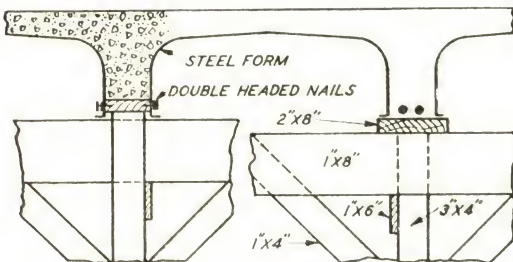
Forms for Reinforced Concrete Joist and Steel Tile Construction
